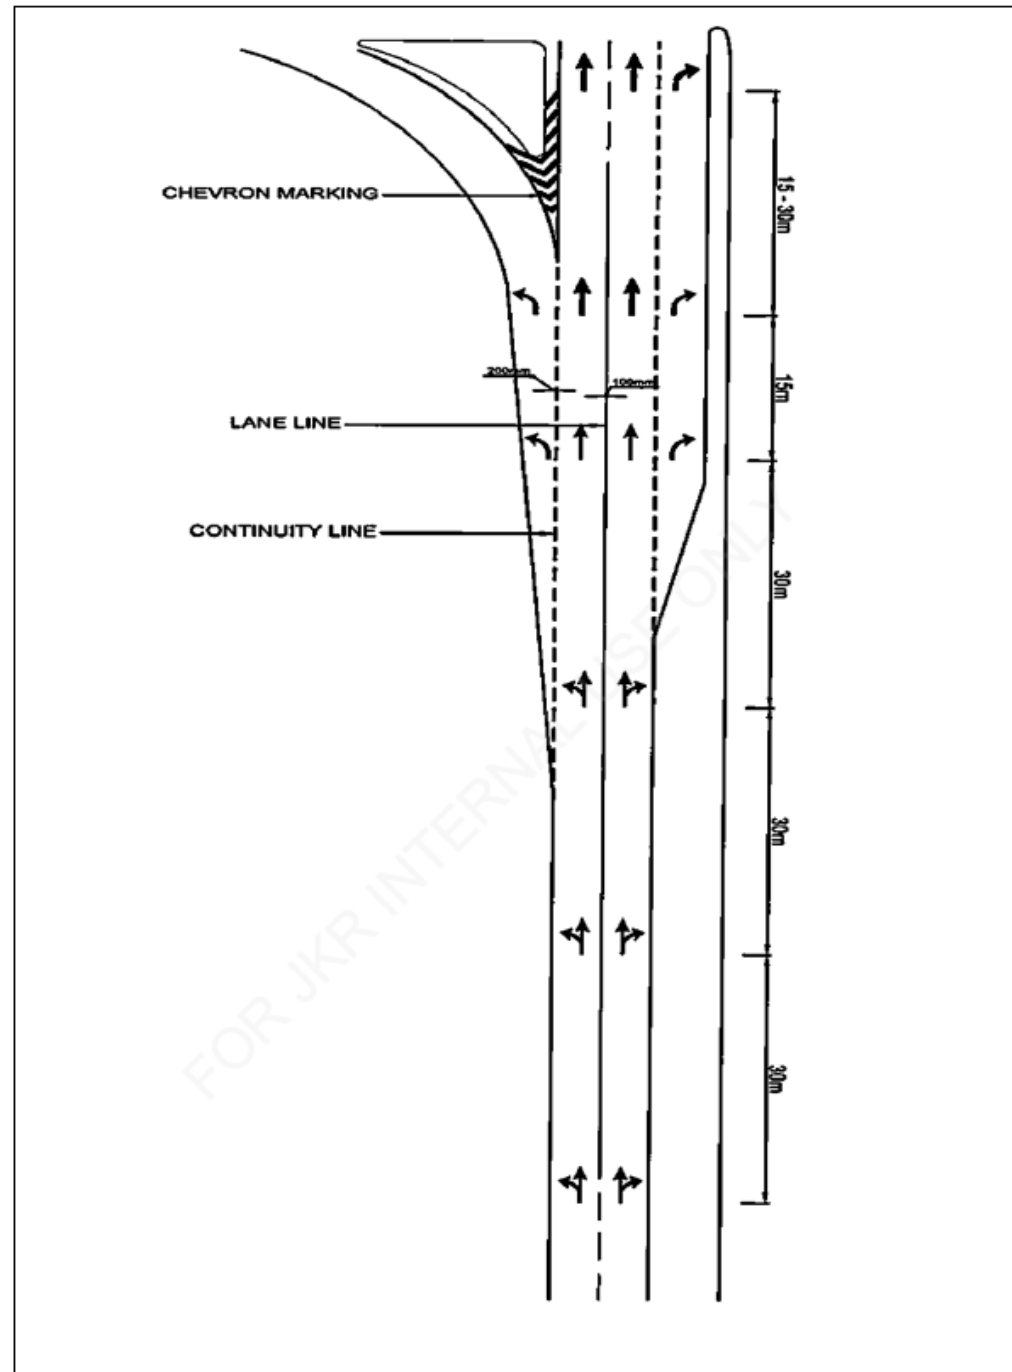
PAVEMENT MARKING ON URBAN ROAD
